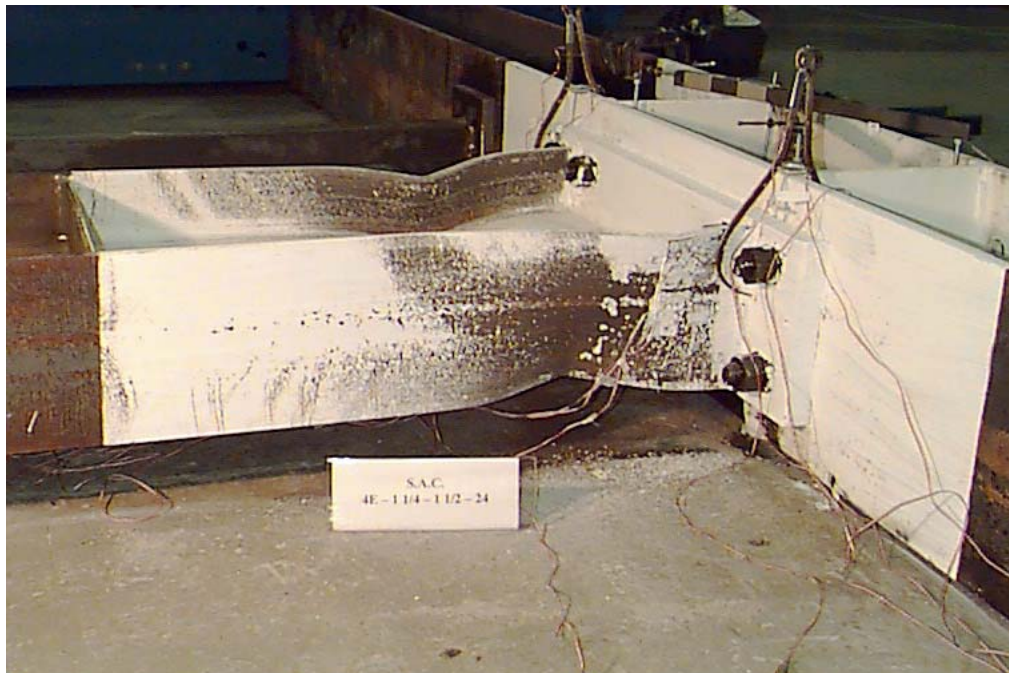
FOUR BOLT EXTENDED UNSTIFFENED CONNECTION AFTER TESTING SHOWING DETAIL OF BEAM FLANGE (4E-1.25-1.5-24)
